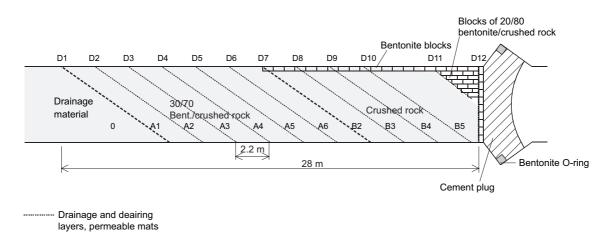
Layout of the Backfill and Plug Test showing the numbering of the backfill sections and permeable mats.
